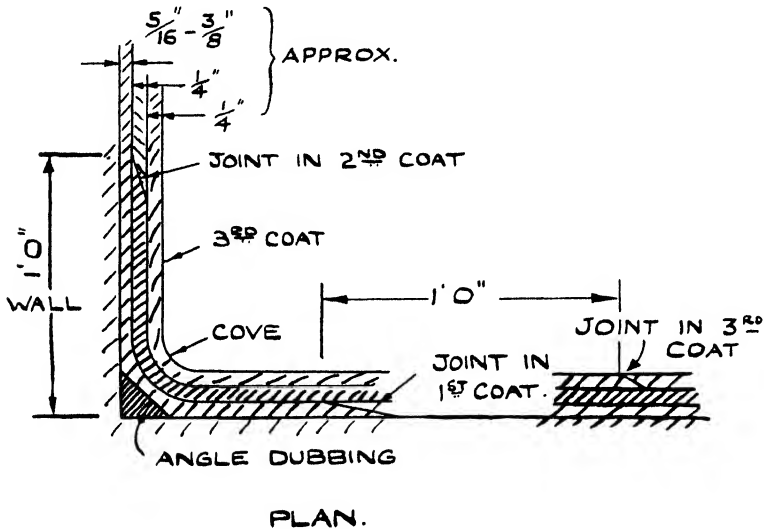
TYPICAL METHOD OF RENDERING WALLS TO A BASEMENT
